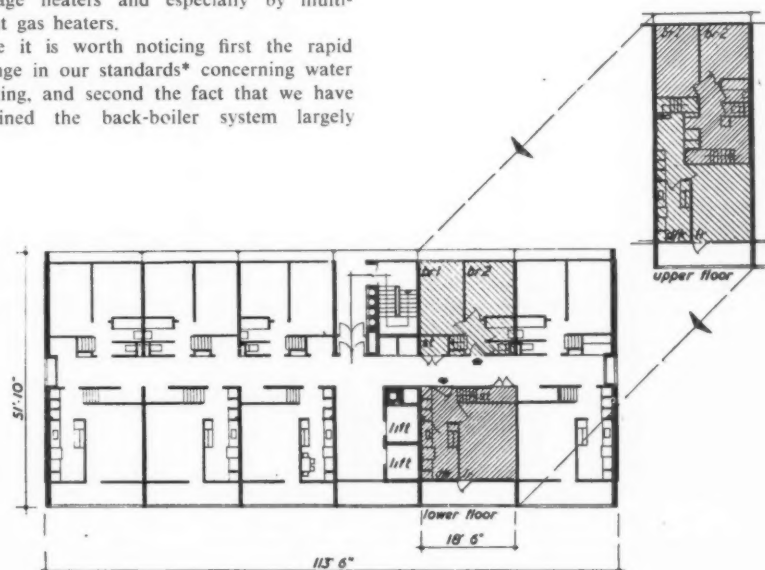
(above). Floor plan of LCC 12-storeyed point-blocks at Roehampton designed for economic central heating. Fig. 6 (right). Floor plan of LCC 19-storeyed maisonette project for Tidey Street, Stepney—another centrally-heated, deep tower-block with mechanically ventilated bathrooms and w.c.'s.
